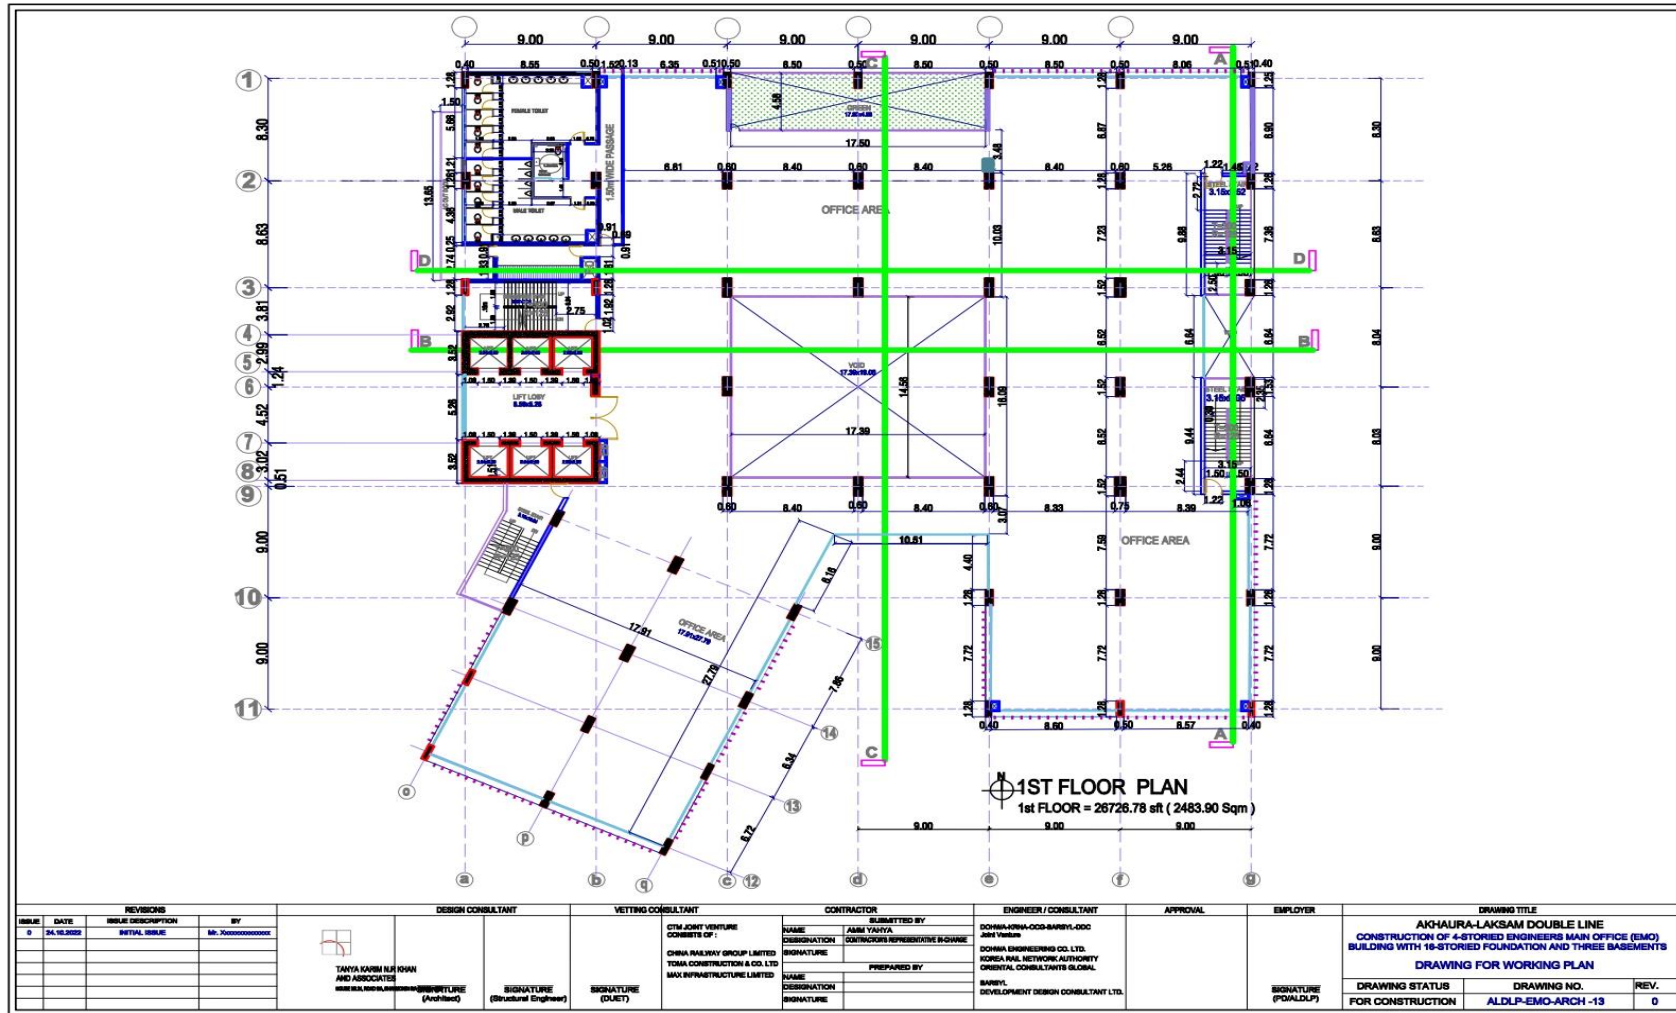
Layout Plan of Proposed EMO Building (1st Floor)
